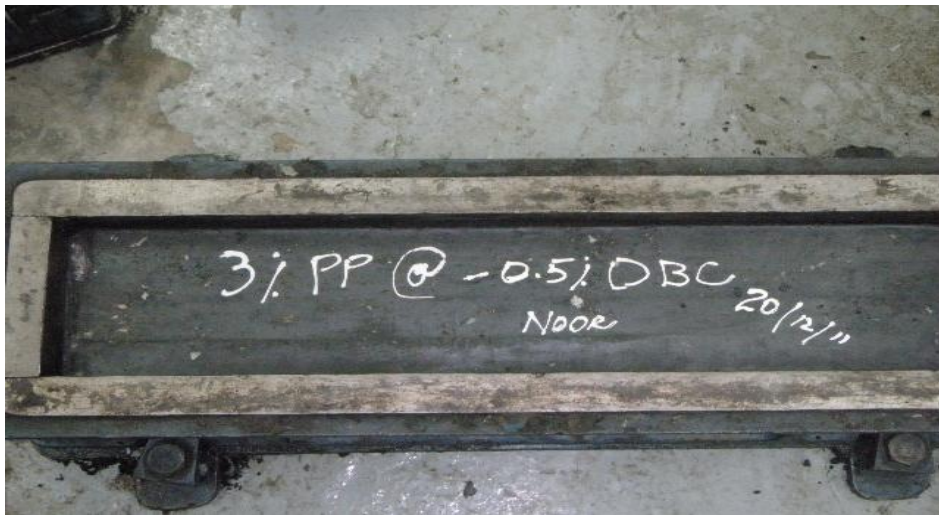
Compacted Beam Fatigue Specimen in mould
